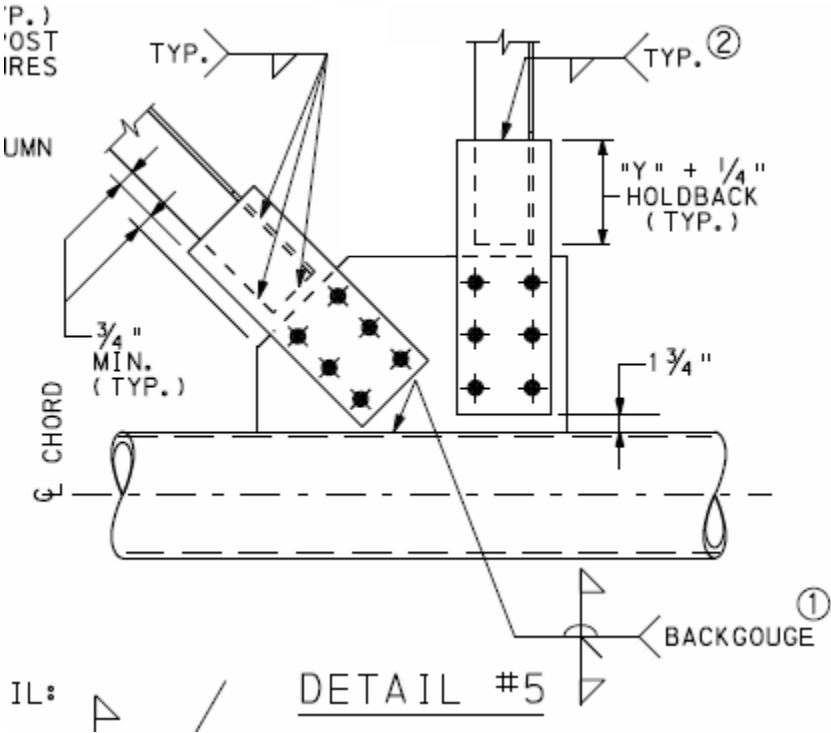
Structural Tee Bolted Connection, With Connection Plate (BC-744M, August 2017, Sheet 7)
